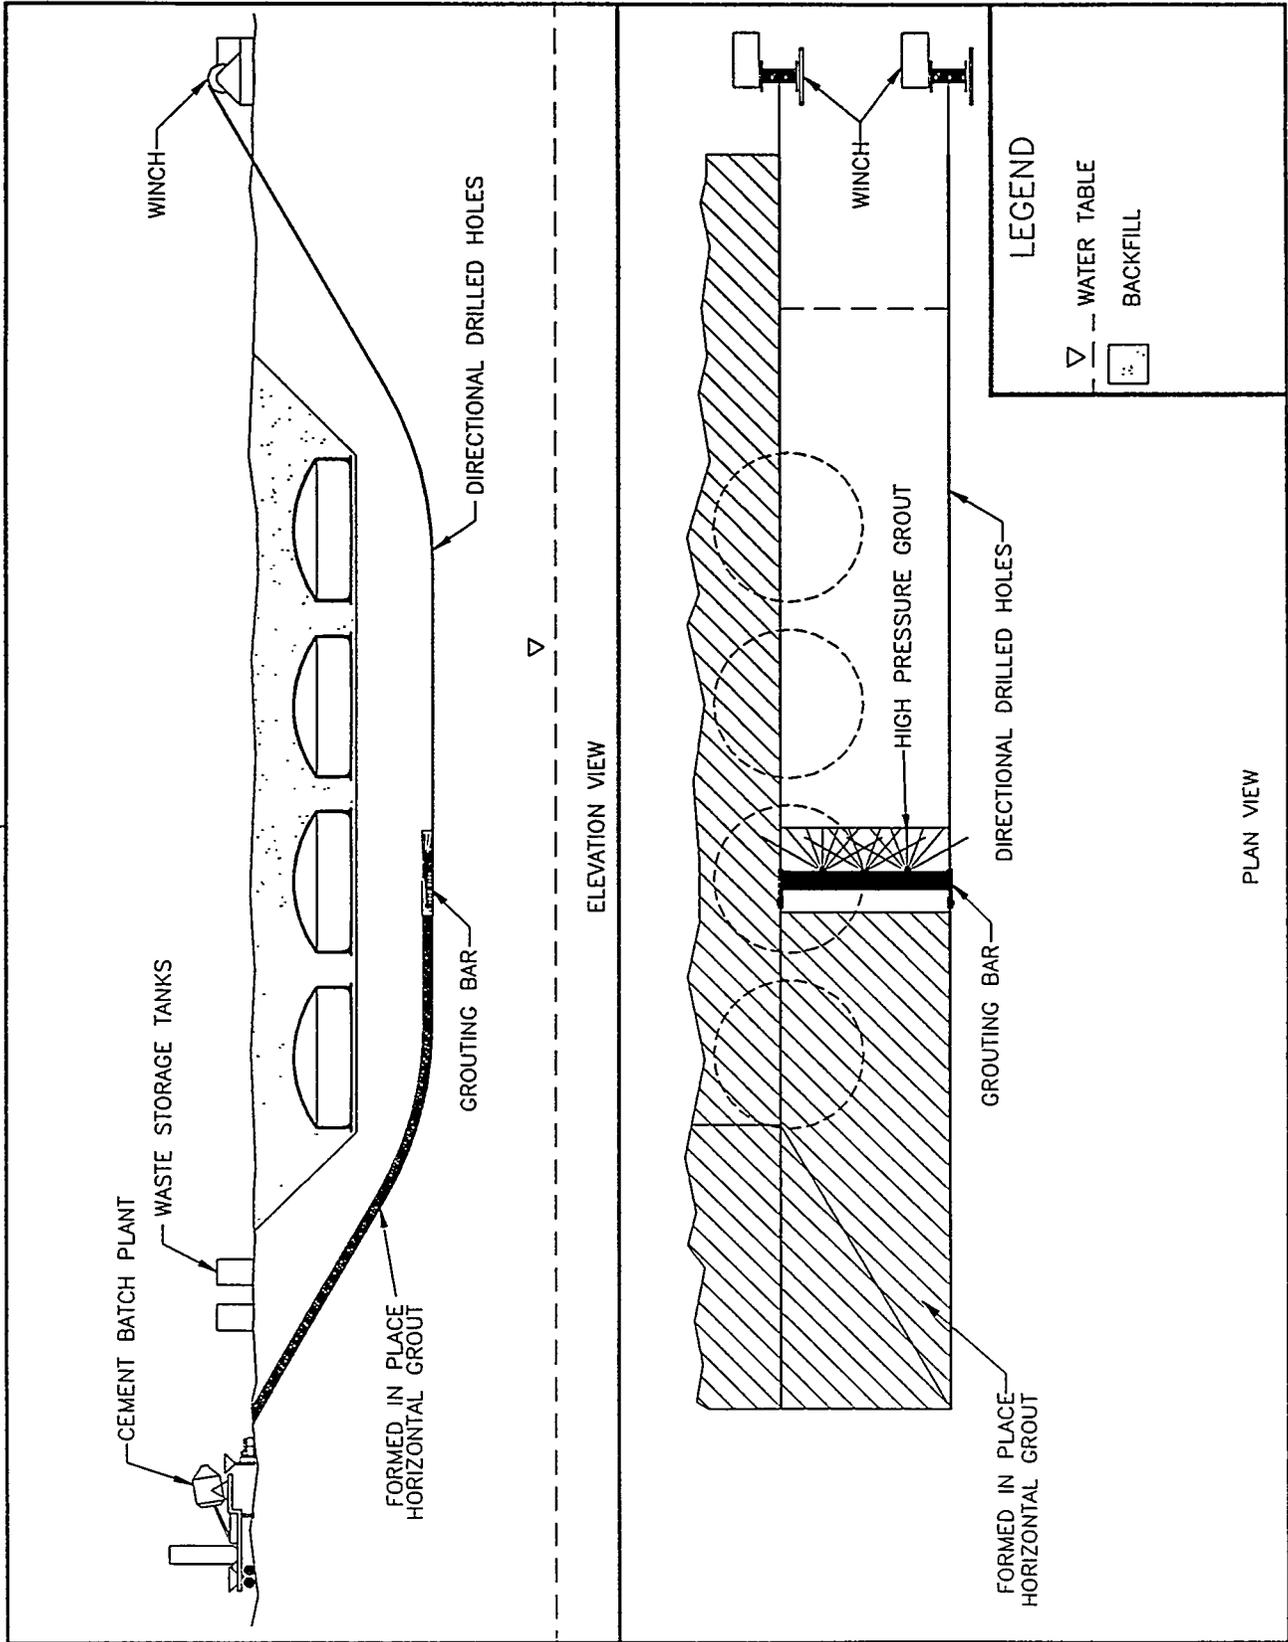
Formed In-Place Horizontal Grout Barrier.
